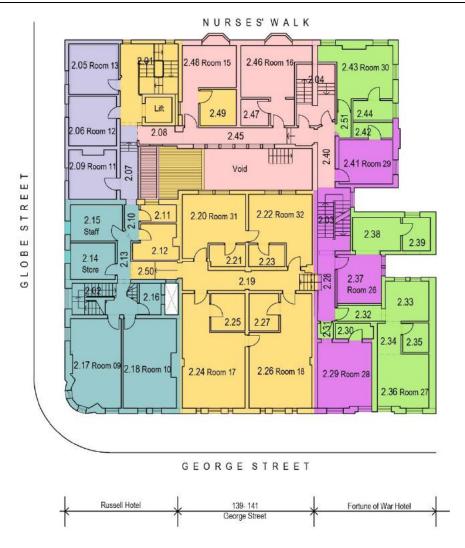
Phases of Development, Second Floor Plan Level, TKD Architects (NTS)
